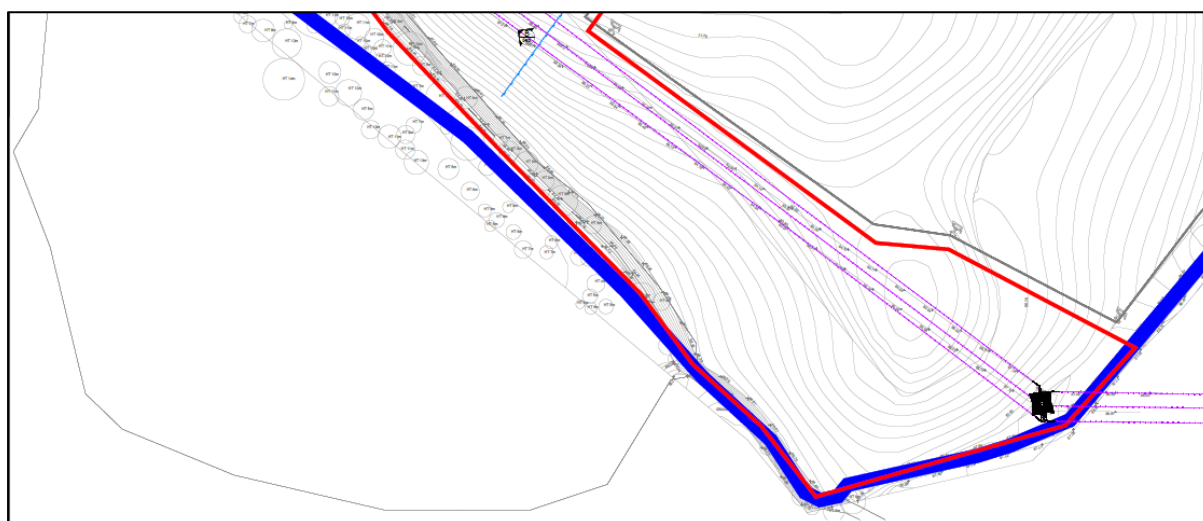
Extract of Proposed Site Layout – Sheet 2 (i.e. southeastern end of site) (Source: MWP Drawing No. 23991 MWP 00 00 DR C 5103)
